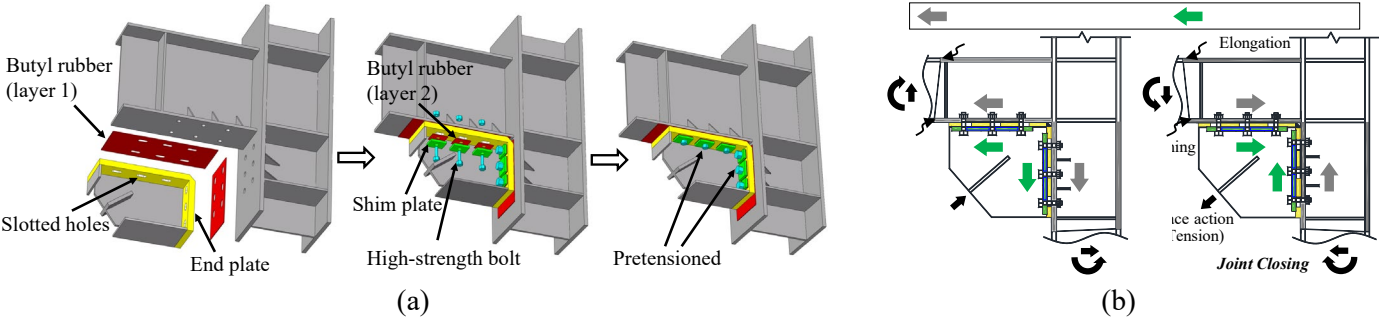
Sliding gusset connection: (a) assembly of components; (b) sliding mechanism
